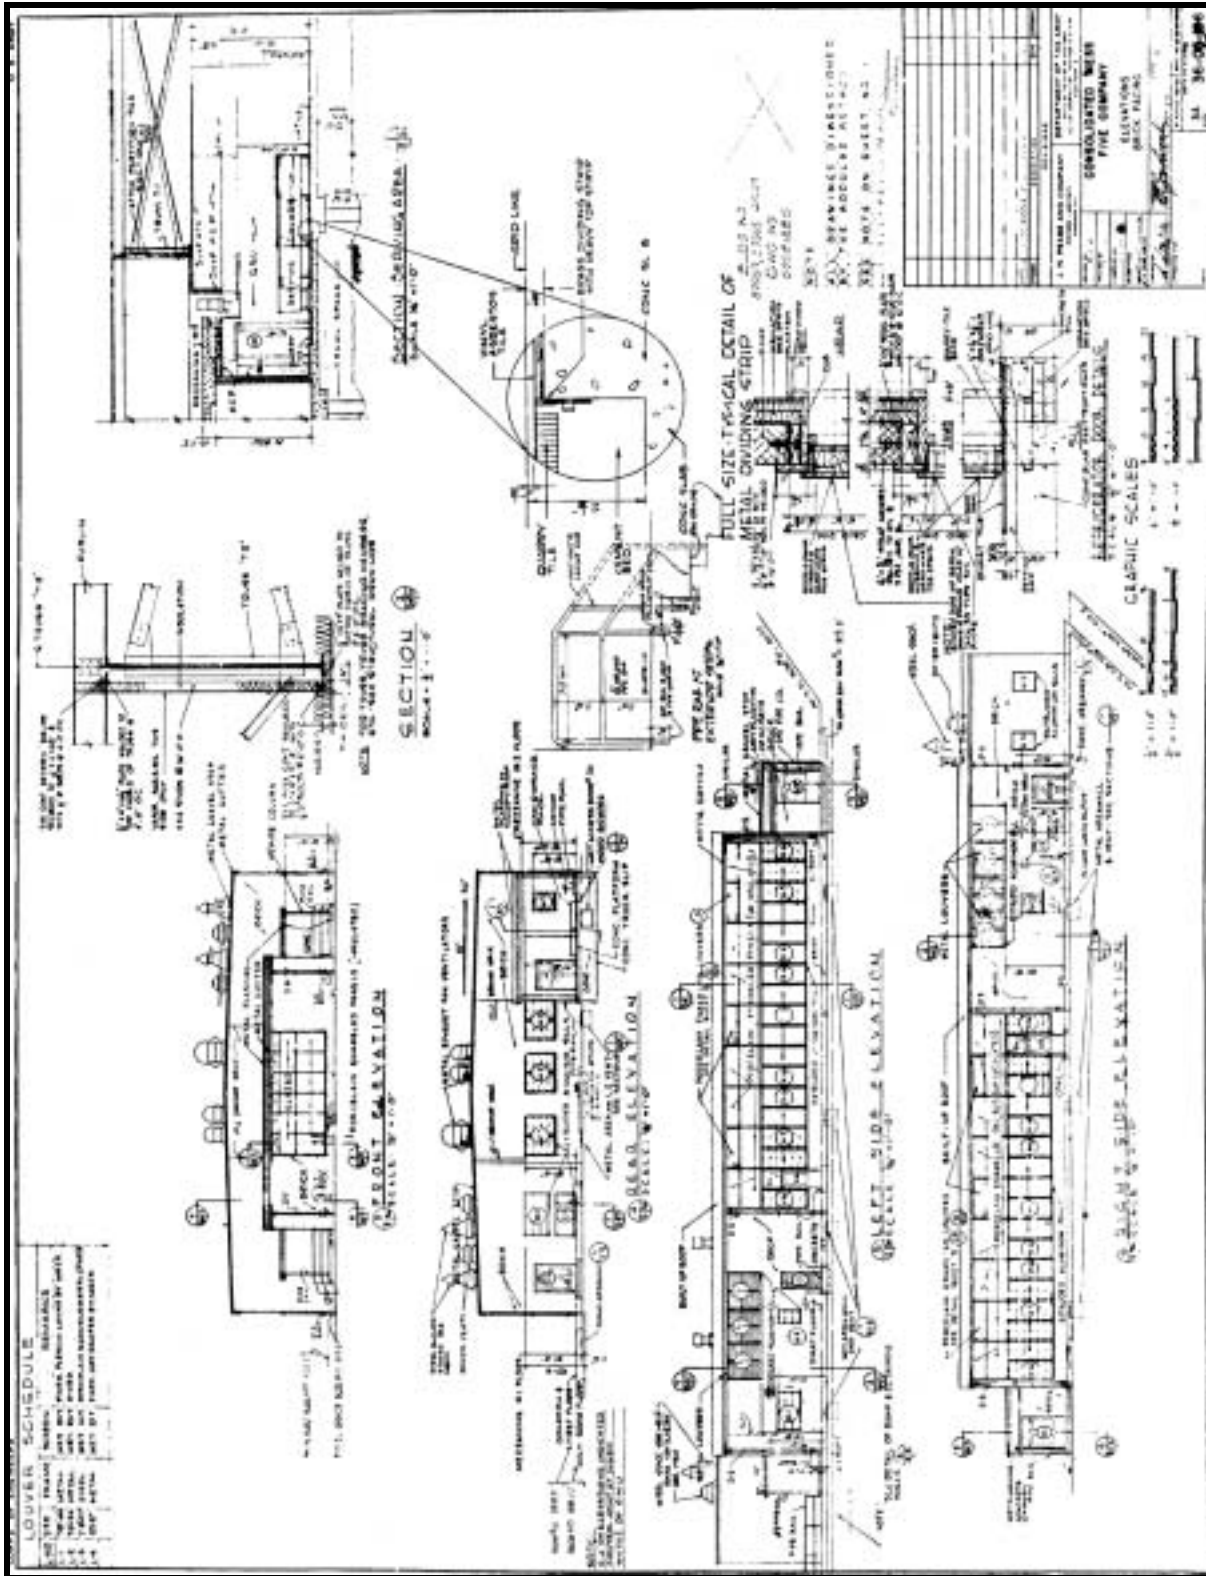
Rolling Pin dining facility, elevations, Ft. Hood (ca. 1960, revised 1967) (Engineering, Ft. Hood).
